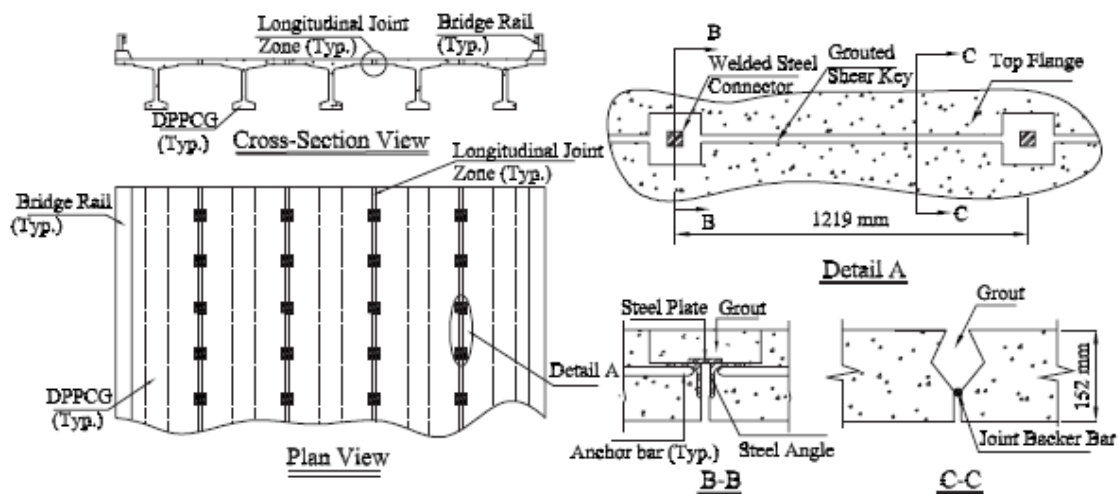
Typical longitudinal joint connection with welded steel plates and grouted shear key (Stanton and Mattock 1986; Ma et al. 2007)
